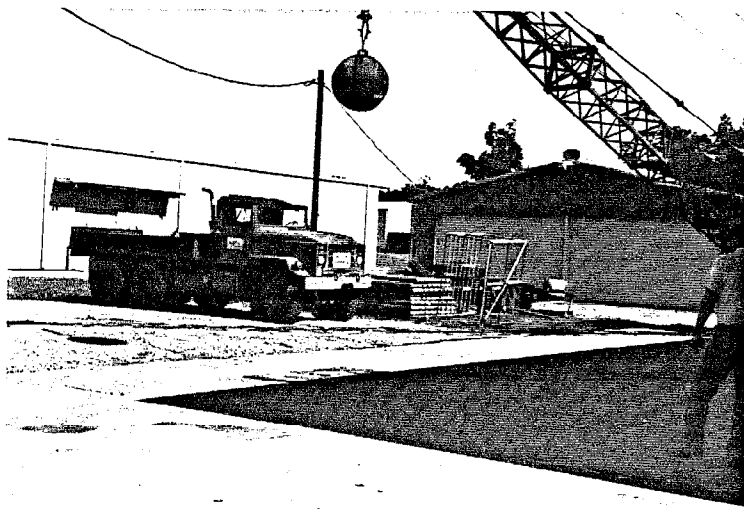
Crane and Headache Ball Used to Crack Slabs
